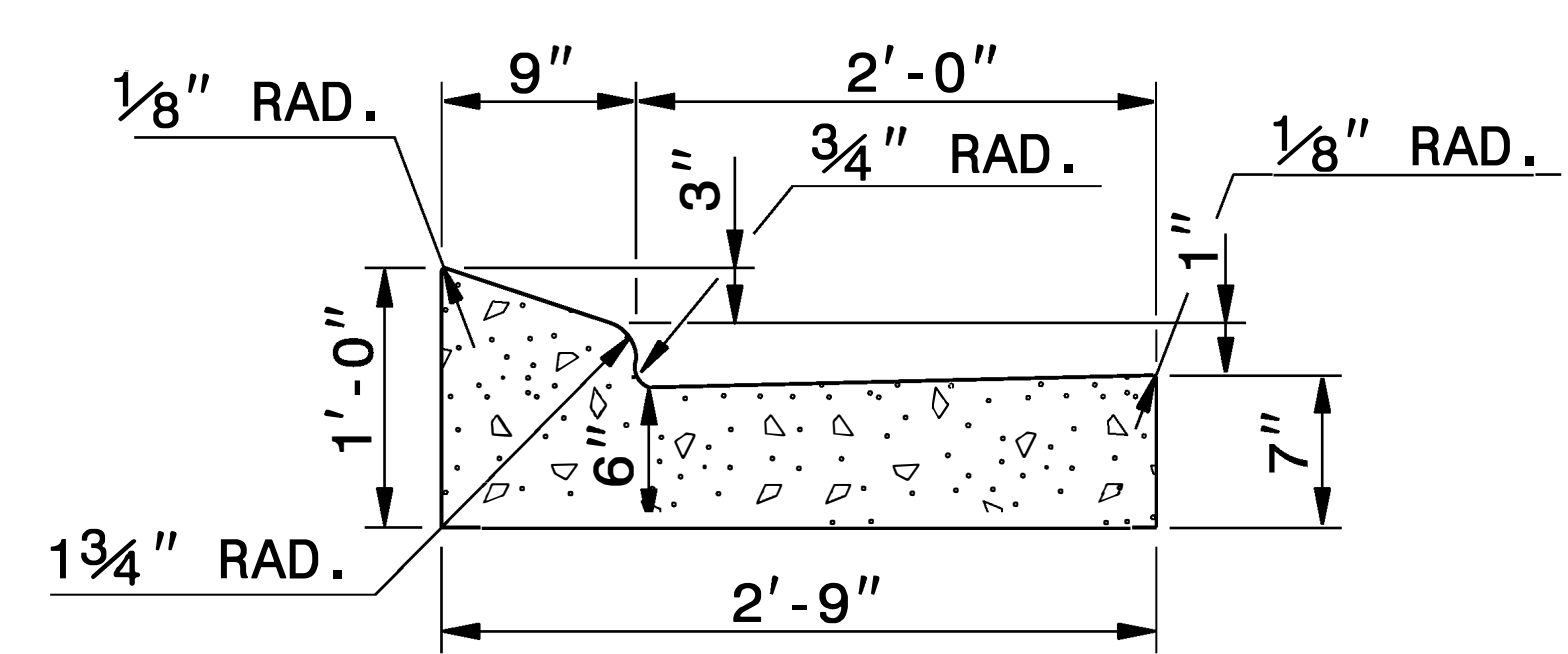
'-6" C&G TO SHOULDER BERM GUTTER TRANSITION SECTION
